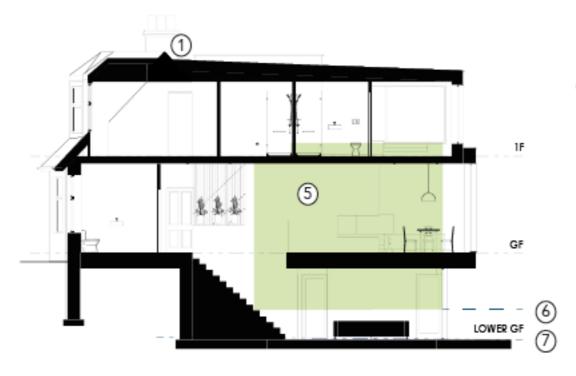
SECTION PROPOSED EXISTING SHOWING FLOOR LEVELS
